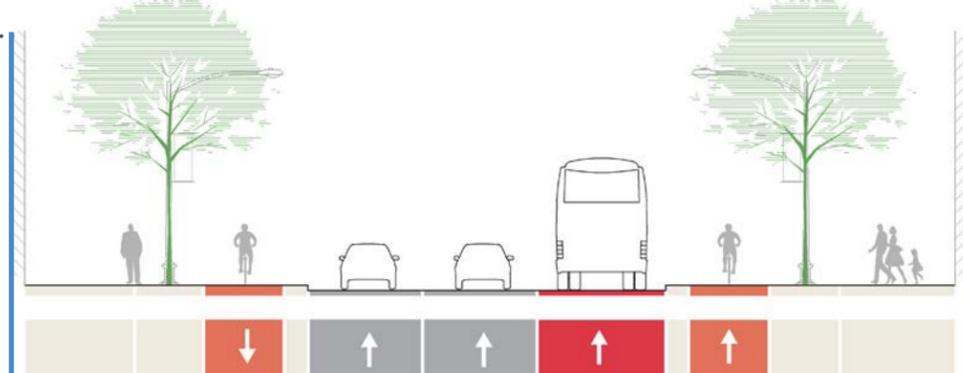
Sixth Street typical section Guadalupe Street to Nueces Street
